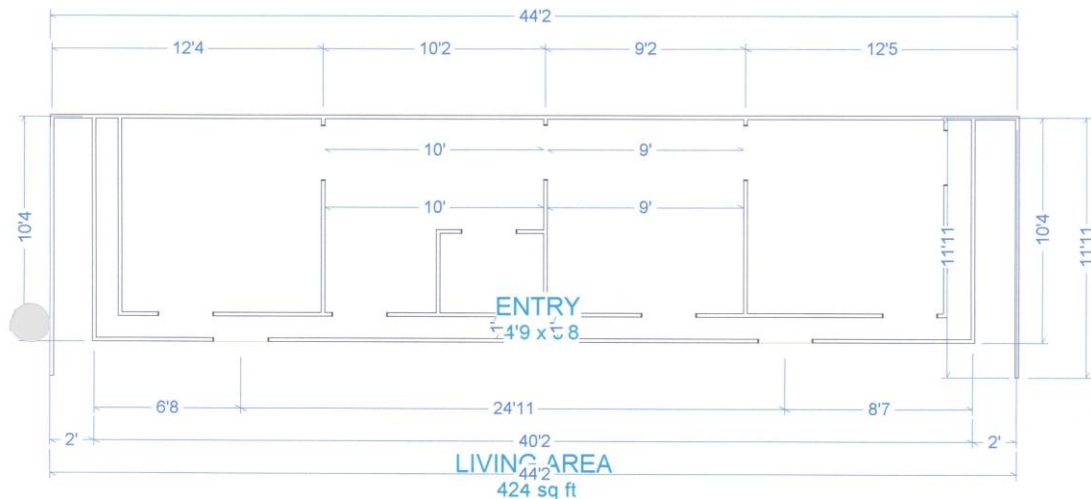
A Proposed Floor Plan for Unit 1: Breeding Unit [Intensive Group Housing]
